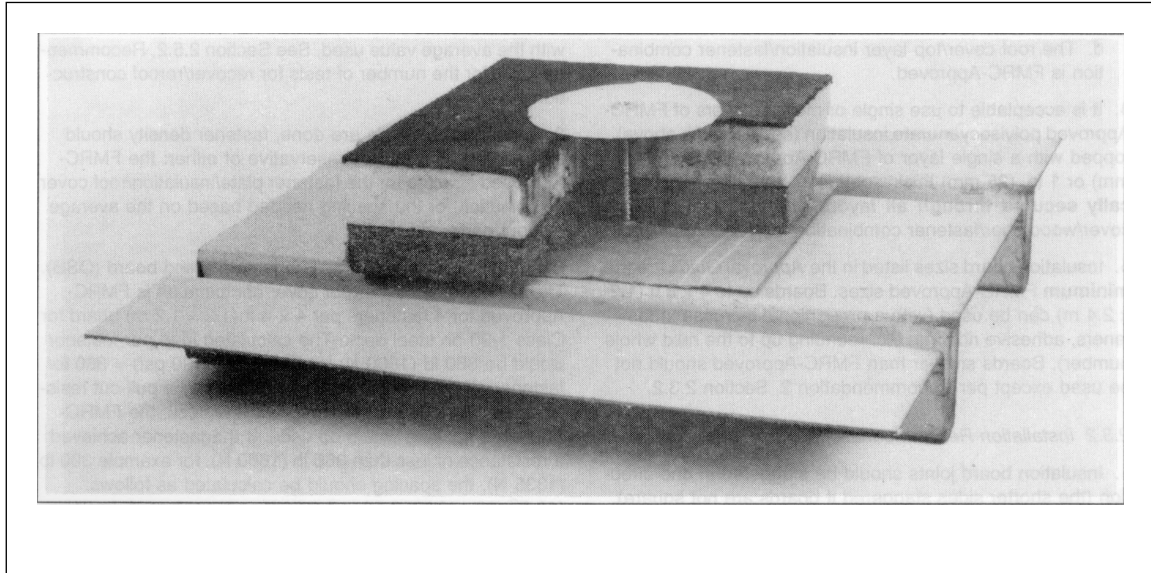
One example of insulation and vapor retarder mechanically fastened to steel deck
